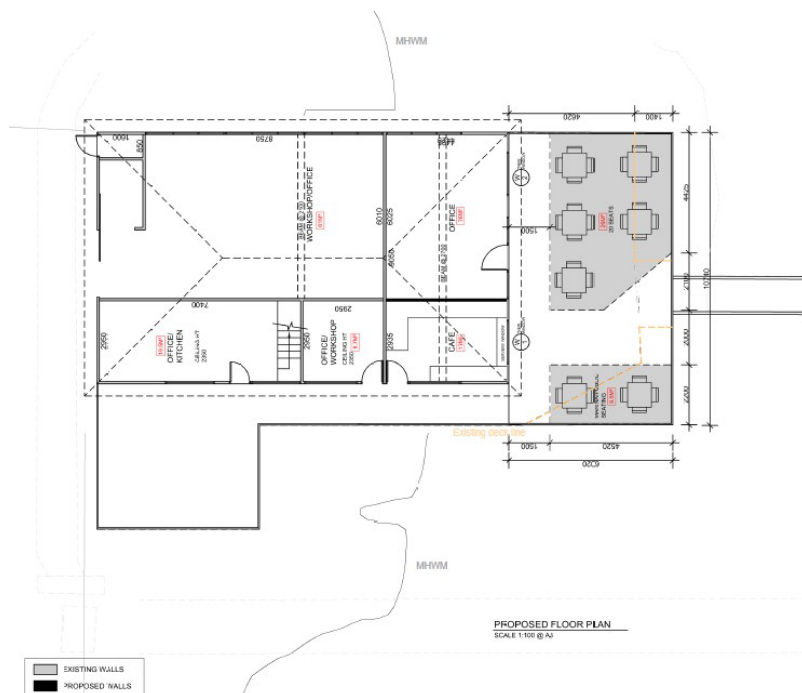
PROPOSED KIOSK AND DECK EXTENSION
